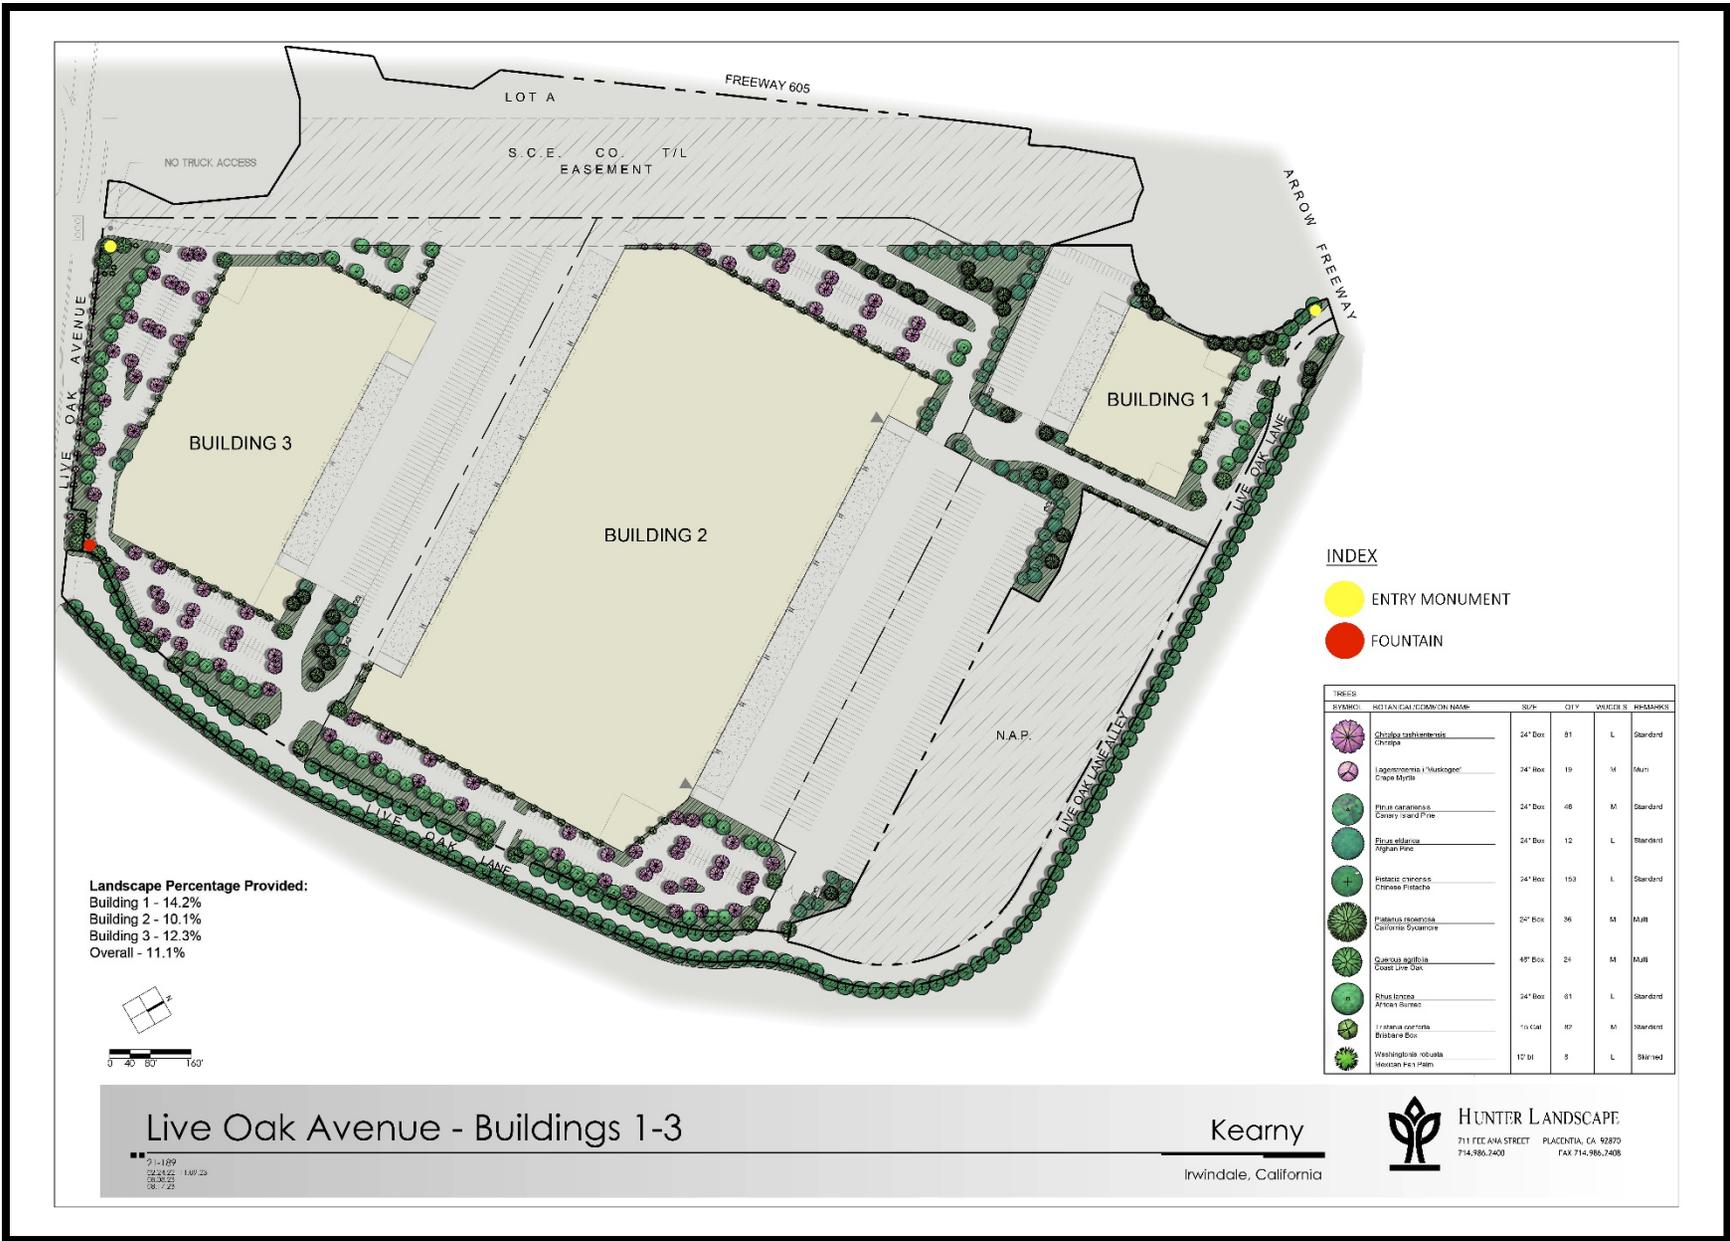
CONCEPTUAL LANDSCAPE PLAN WITHOUT BESS
